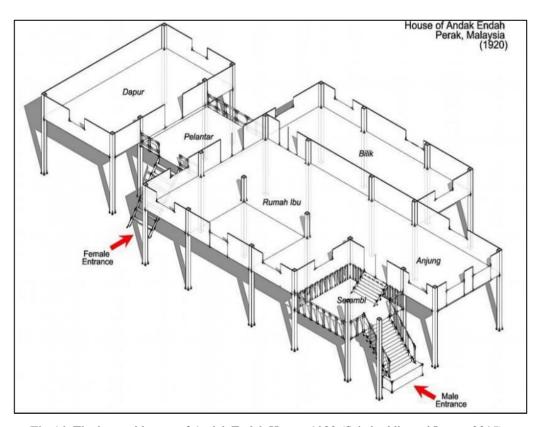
The internal layout of Andak Endah House, 1920 (Sahabuddin and Longo 2015).
